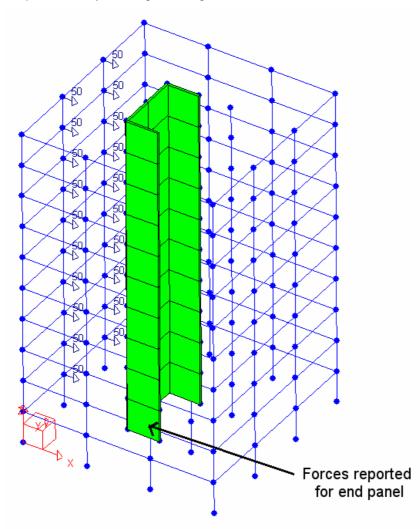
Simple Building with C-Shaped Core Wall viewed in S-Frame
